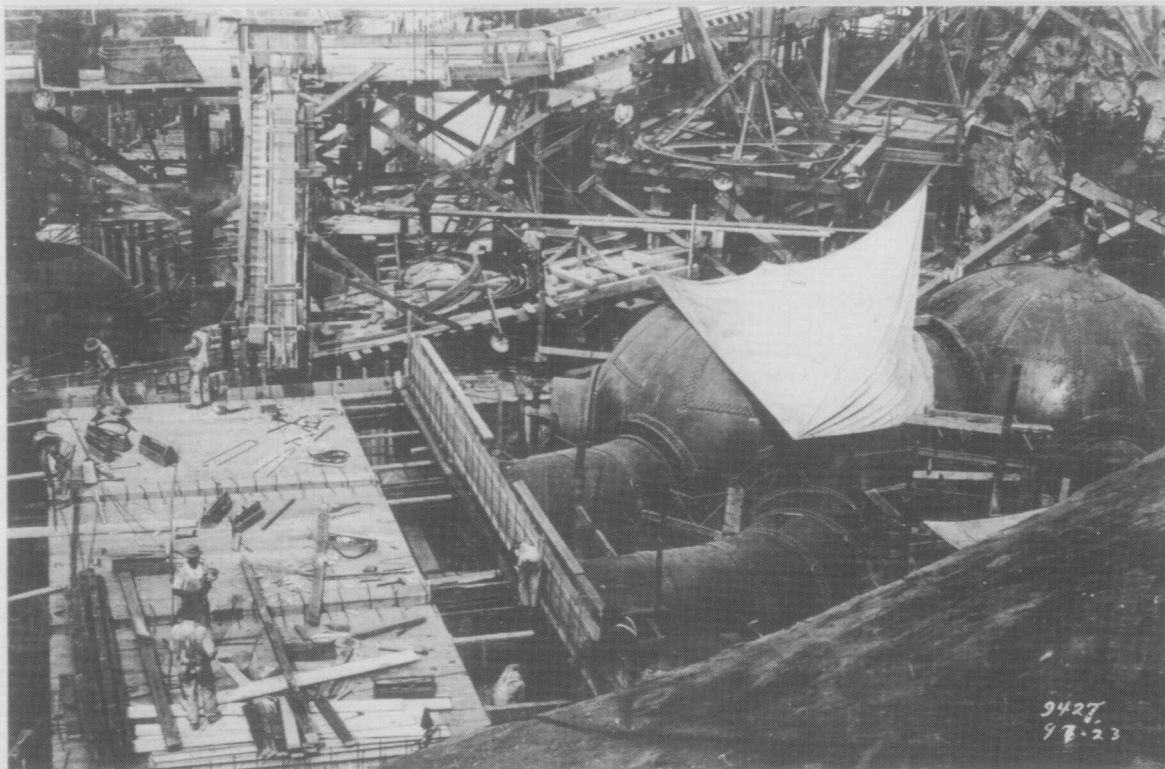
Installing the manifold at Powerhouse No. 3, 1923 (SCE
